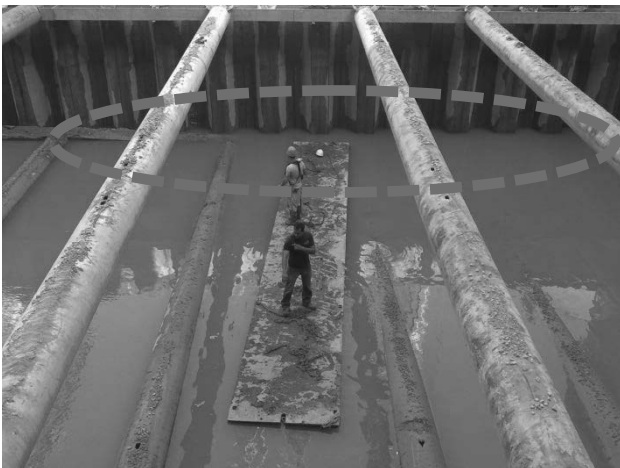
Situation at 2<sup>nd</sup> level girder (collapsed during excavation)
